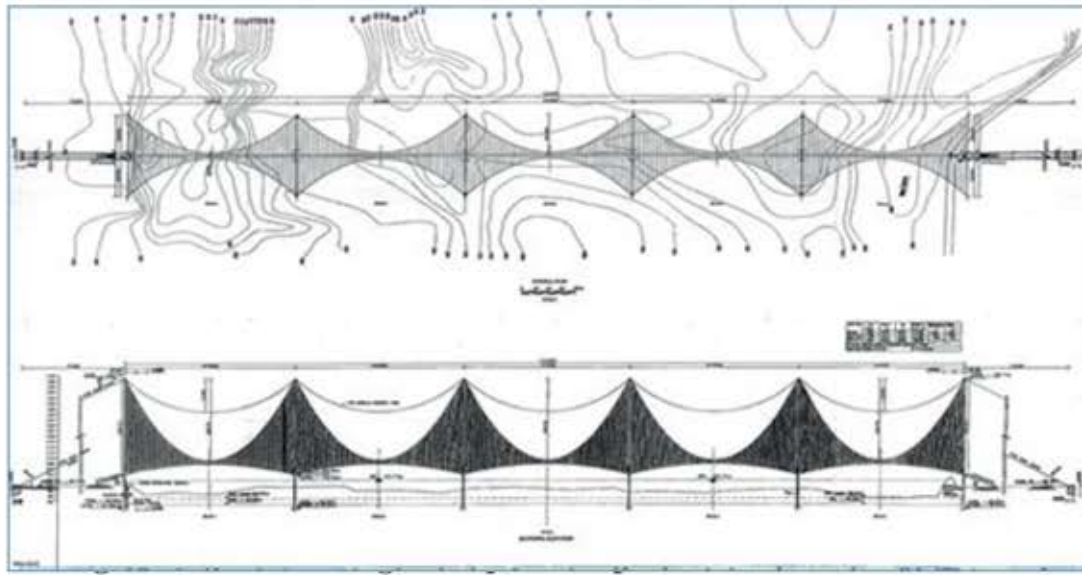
Multi-span continuous Suspension bridge (Department of Road, 1999)
